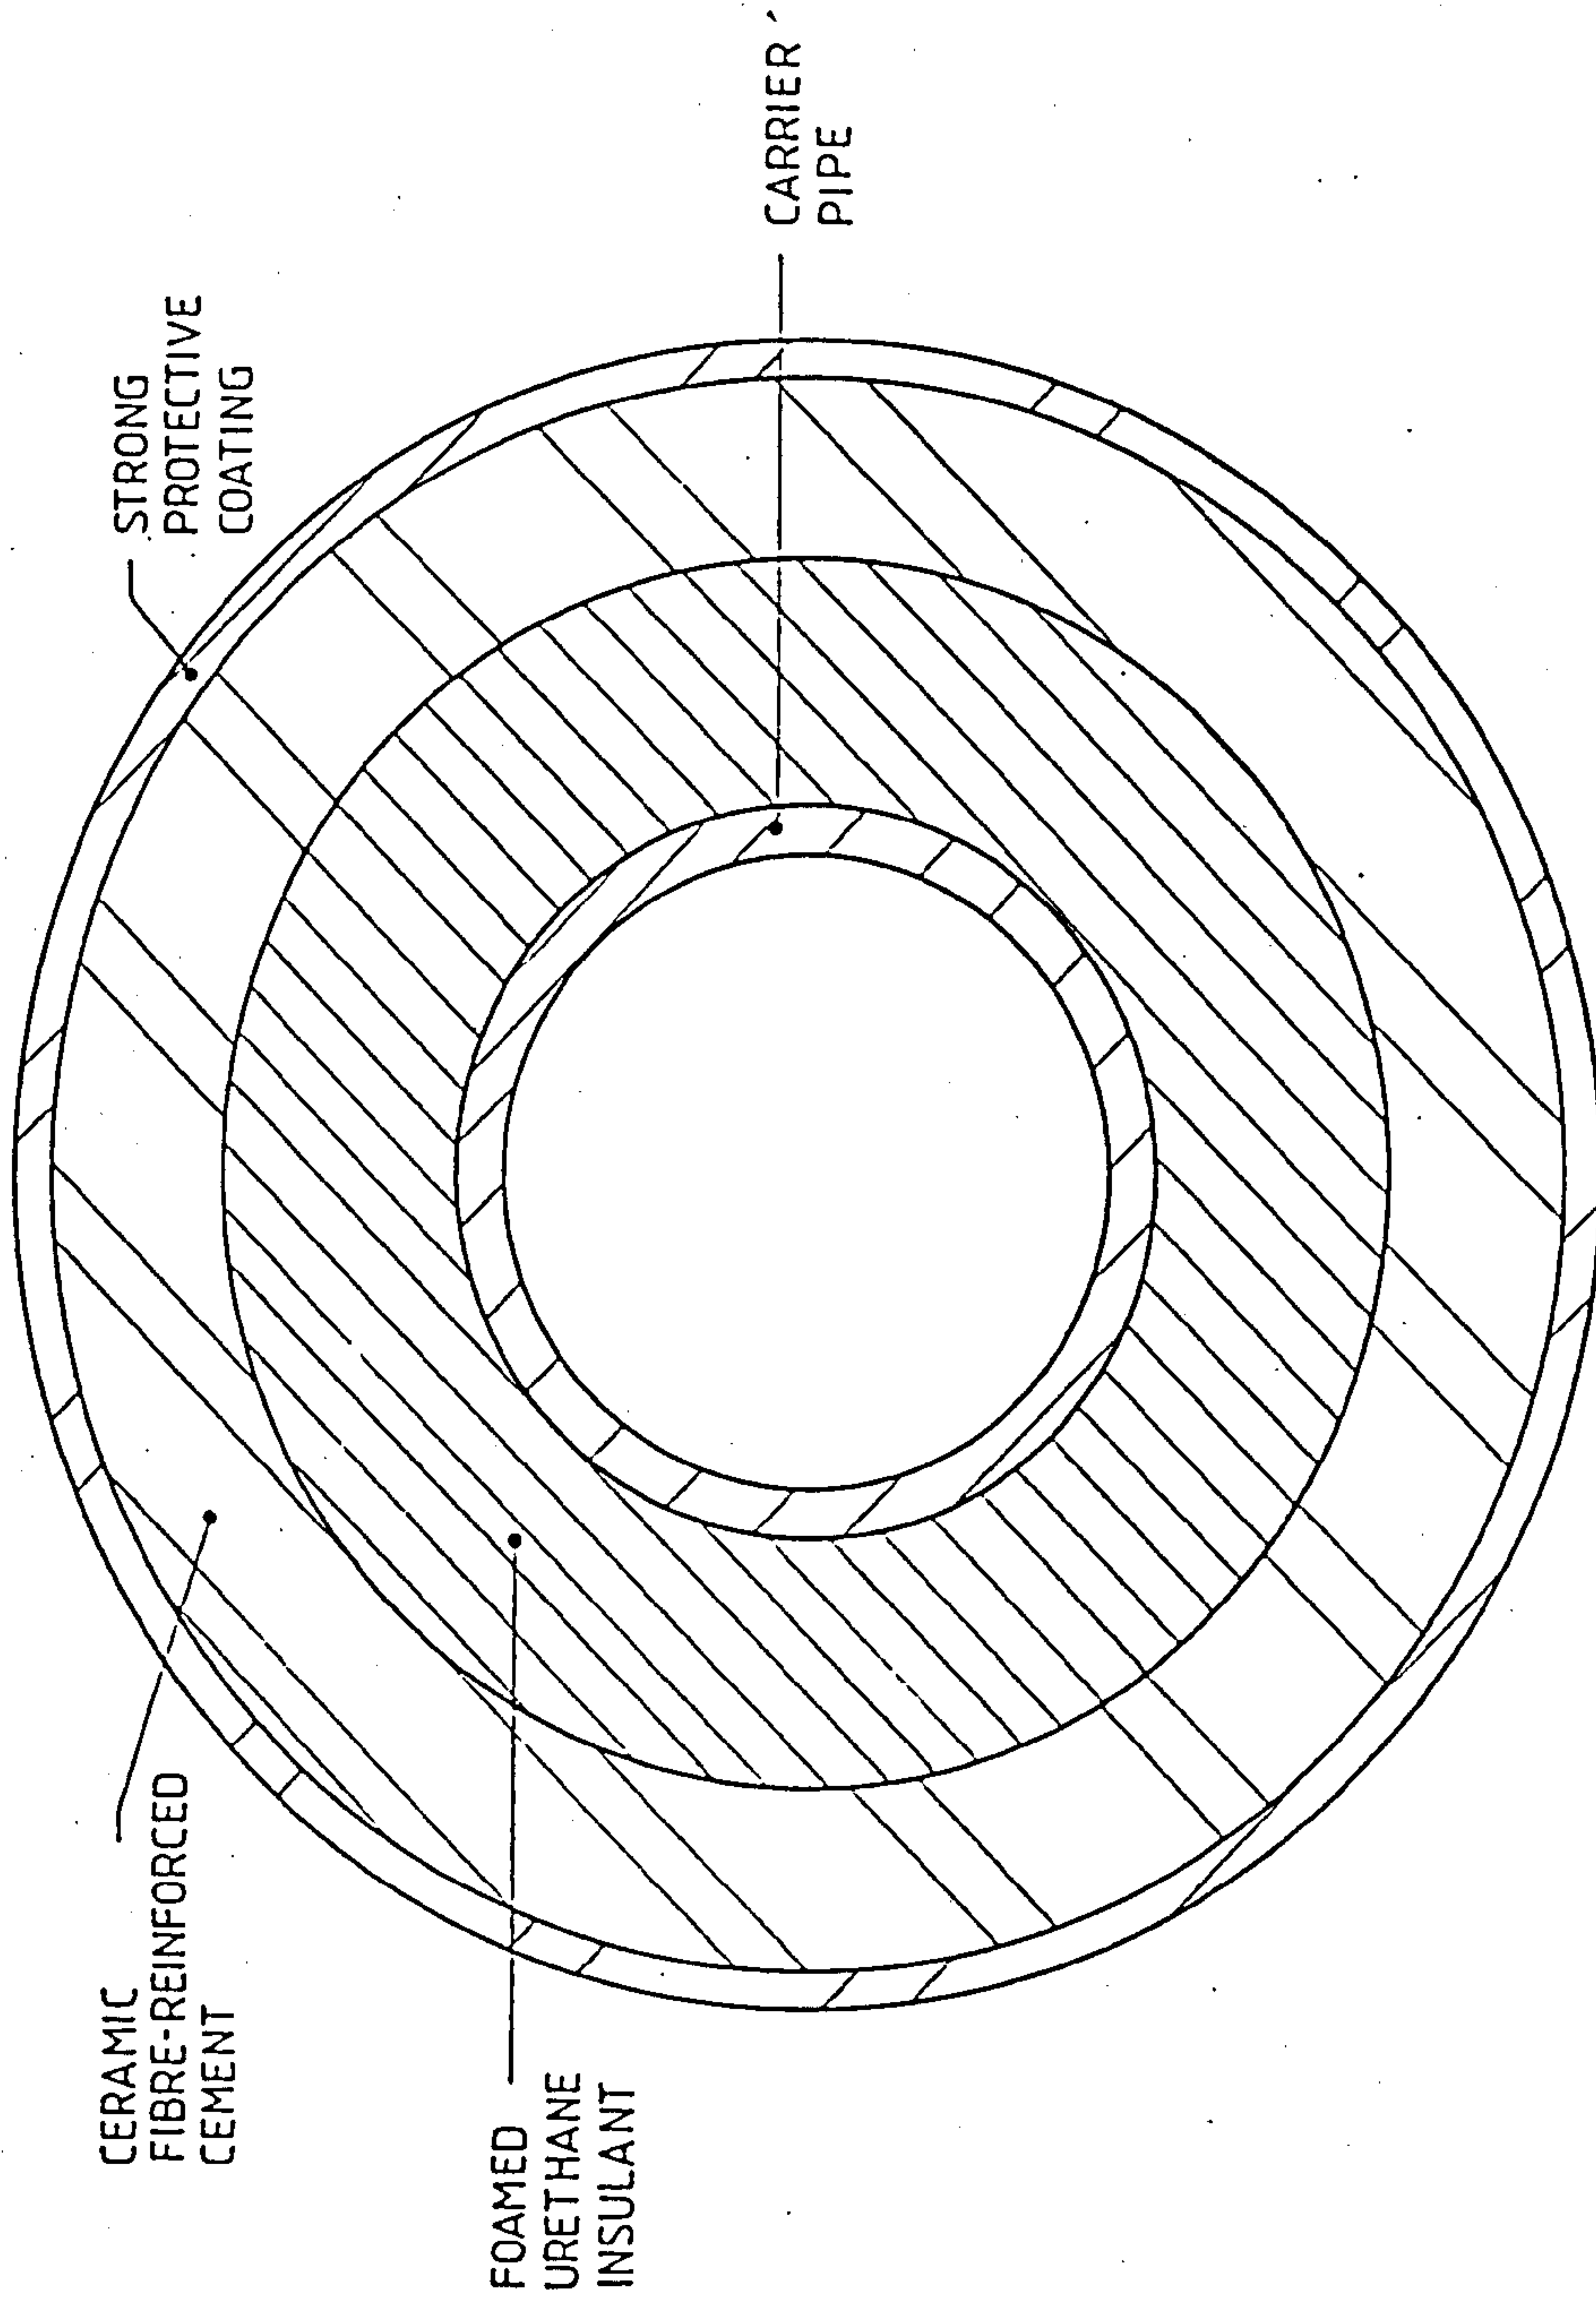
Cross-section through a prefabricated pipeline for DH systems (60).
